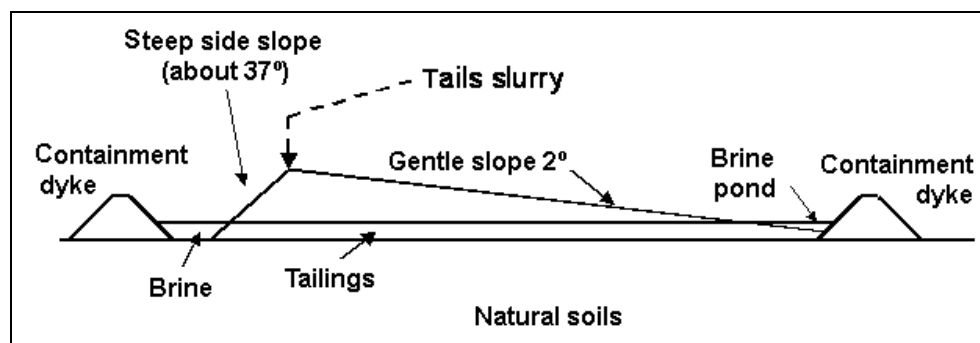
Typical cross-section of Canadian tailings piles (schematic)
